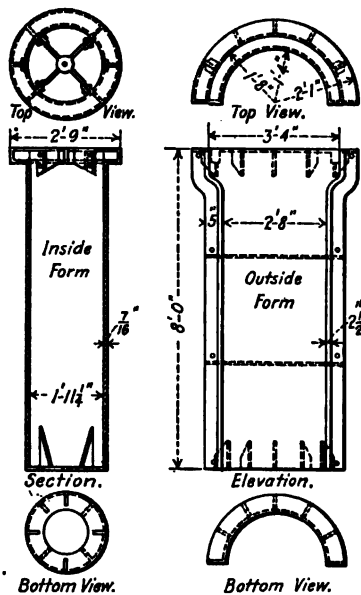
Details of 24-Inch Concrete Pipe Form.
